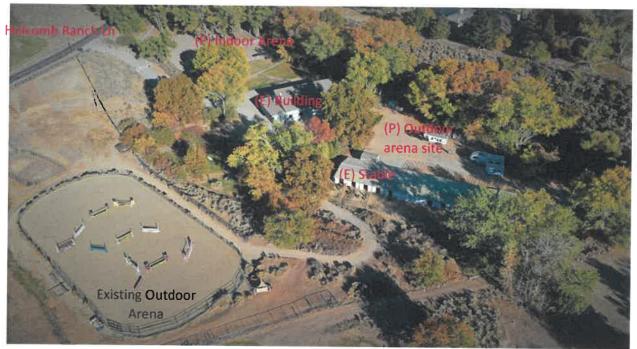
Layout of existing site showing where new buildings and layouts will go.
